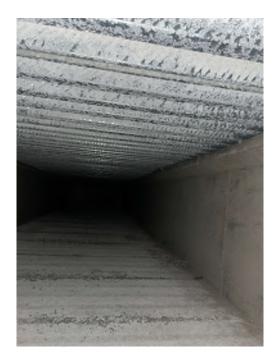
Deck core hole D12, view inside box girders, note white corrosion oxidation product on SIP formwork, additional view
